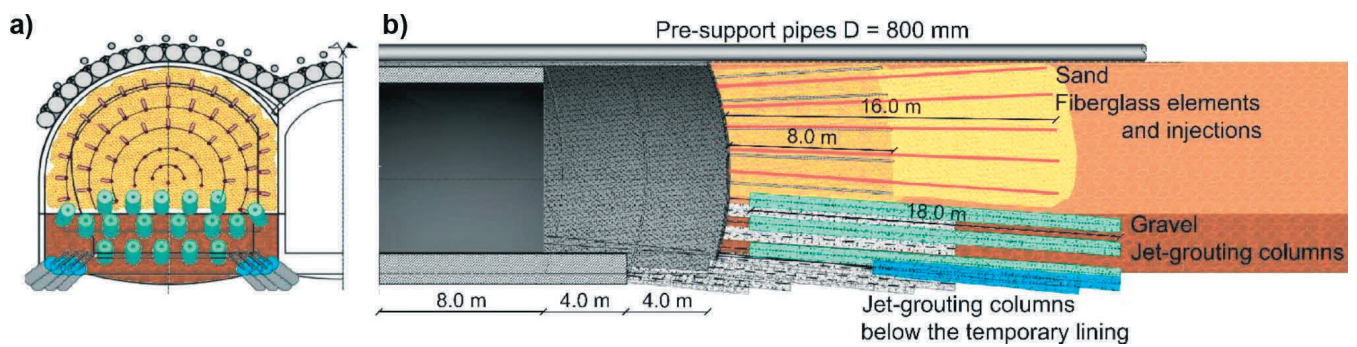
Ground improvements in the upper and lower part of the excavation face.
